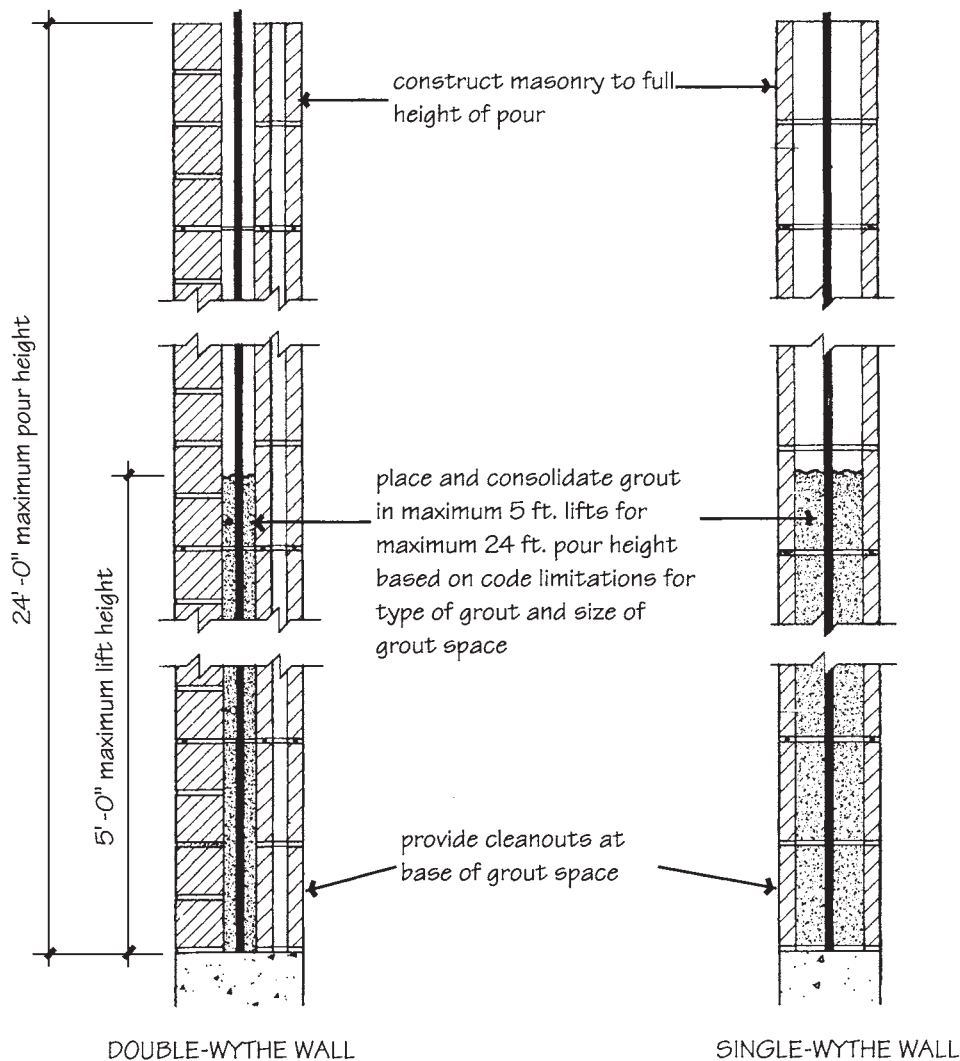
High-lift masonry grouting. (From *Grouting Masonry, Masonry Construction Guides Section 7-11, International Masonry Institute, 1997.*)
